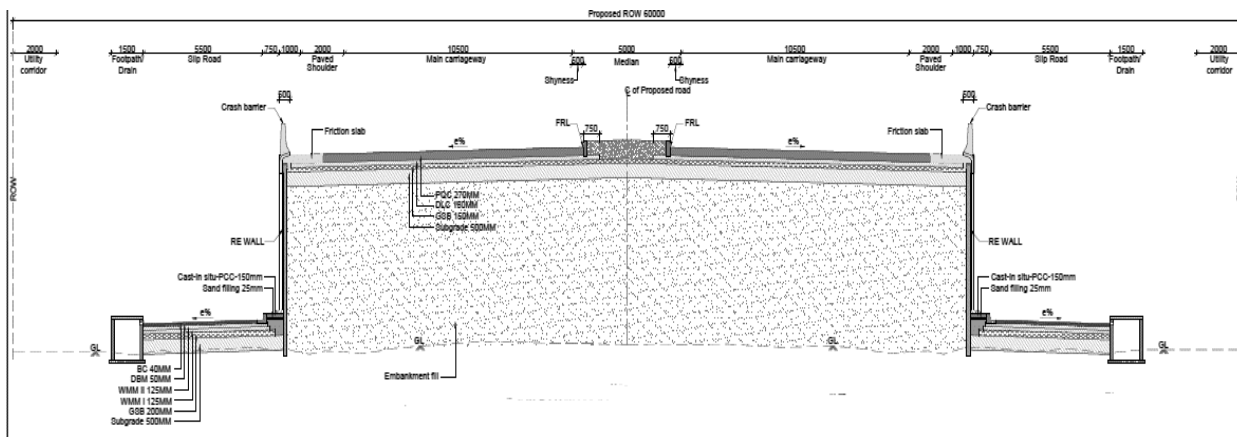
(TCS-6C) Four Lane Underpass Cross Section with Slip Roads in Bypass & Realignment
